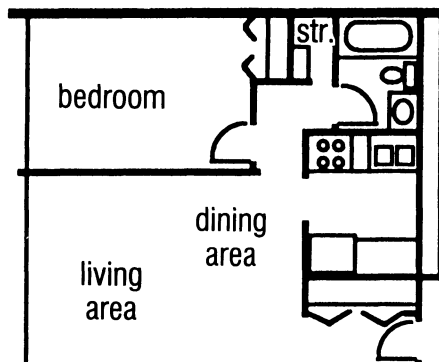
Typical floor plan of Warren Village, Denver, Colorado (Illustration: Sink Combs Dethlefs and Debra Foster).
